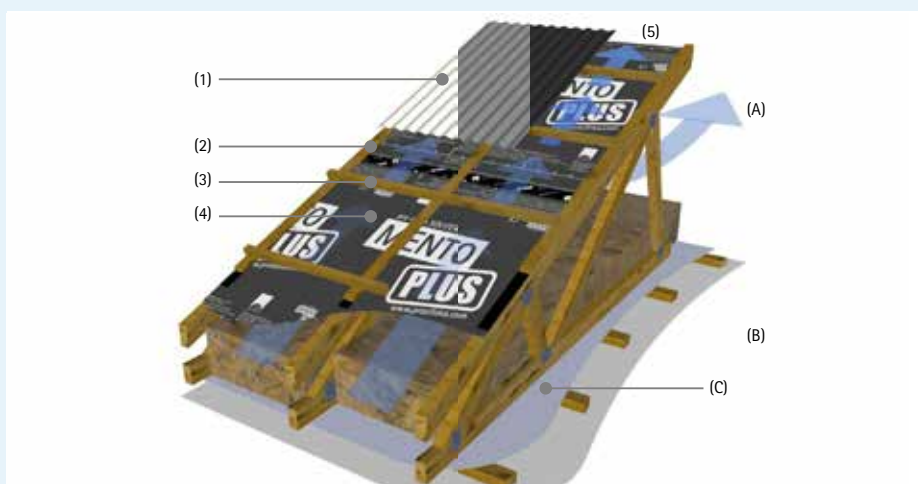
INTELLO® PLUS Intelligent Air Barrier system at the ceiling line coupled with a services cavity allows a continuous and undamaged vapour control layer which limits the upward movement of interior air into the roof space. This reduces the moisture entering the roof space assisting the ASV strategy to keep your roof dry. The large attic void should always be ventilated unless a specialist hygrothermal expert advises otherwise.
